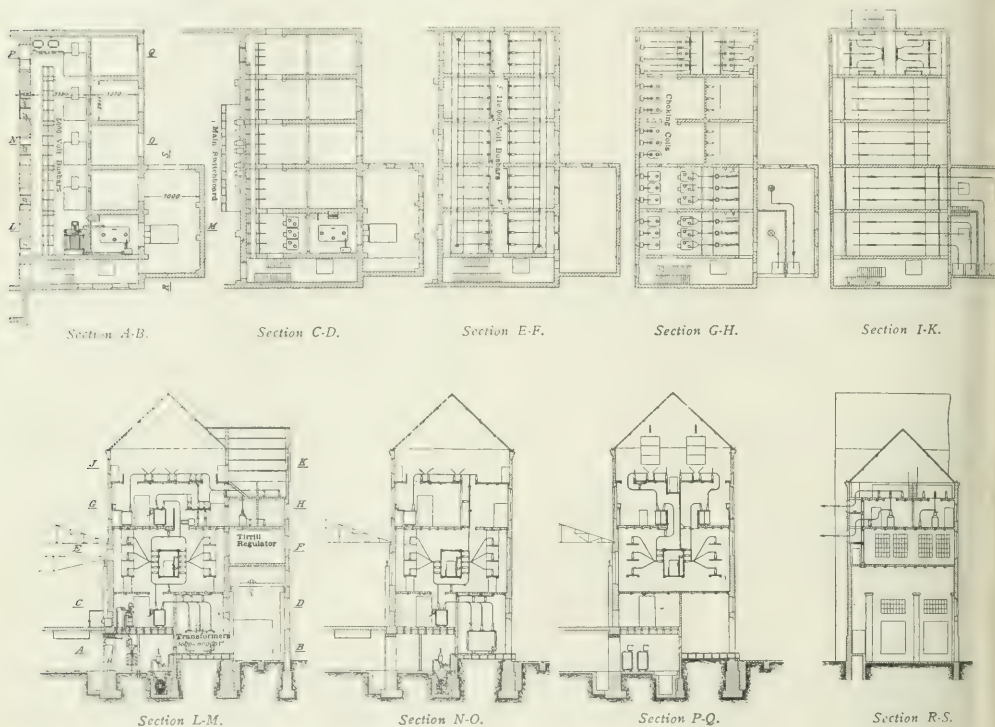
Elevations and Sections of Switch House at Lauchhammer.
